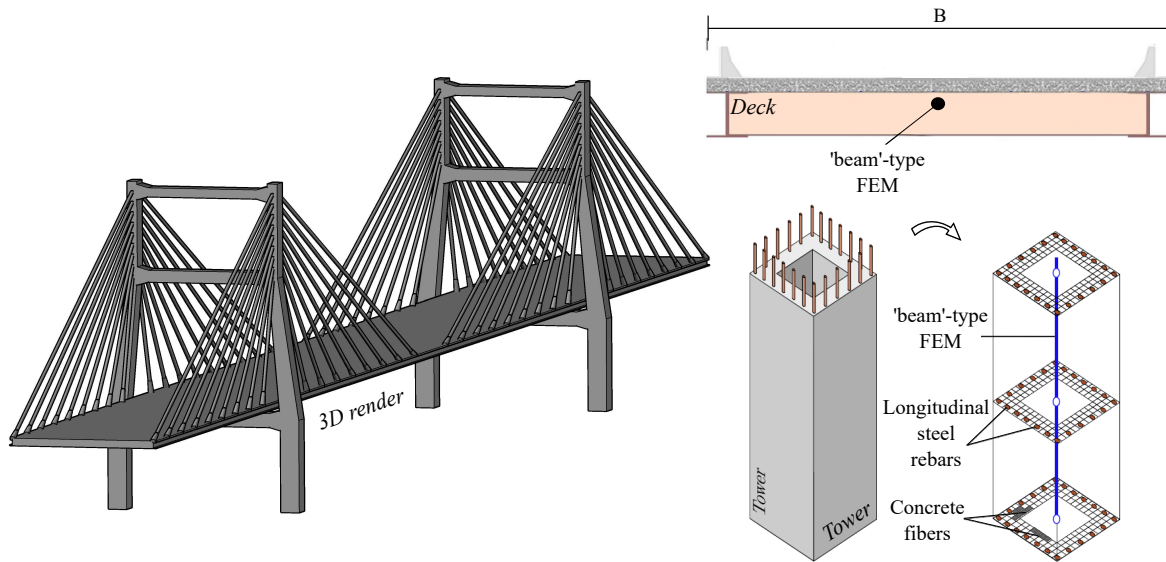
3D model of the bridge and FE modelling of the deck and towers.
